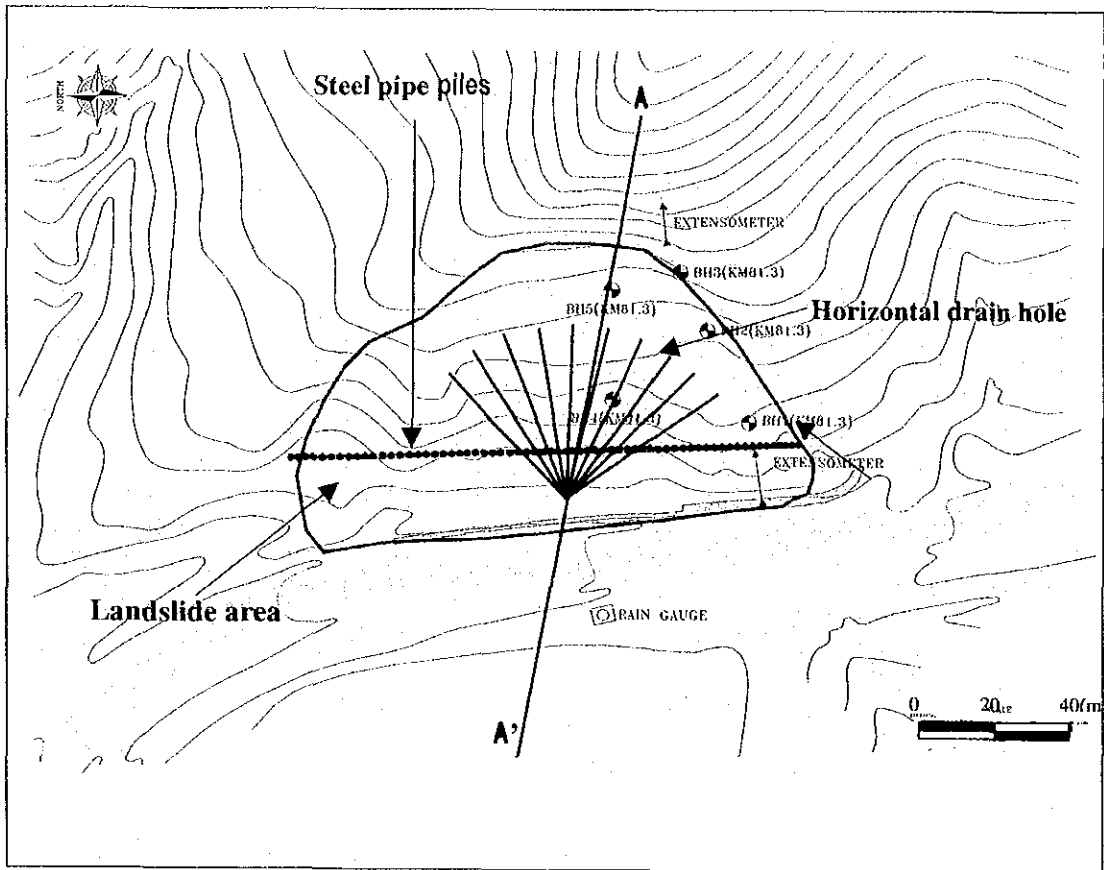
Plan of Steel-pipe pile works in CH 81.30 km
